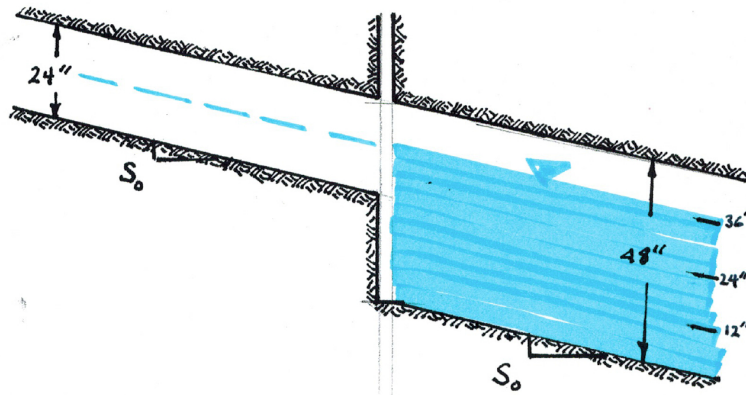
Sewer pipes connected at a junction box. Matching soffit elevations.
